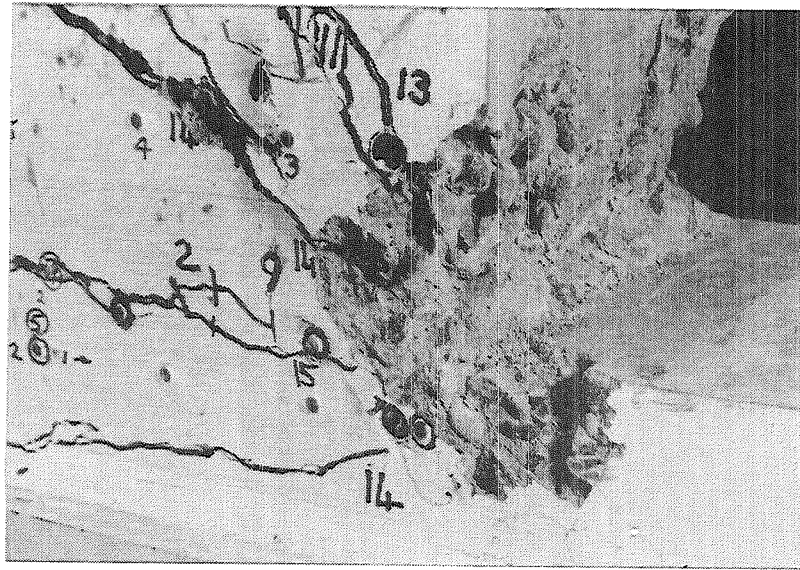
Critical Compression Zone of Beam N2-S63 at Failure
